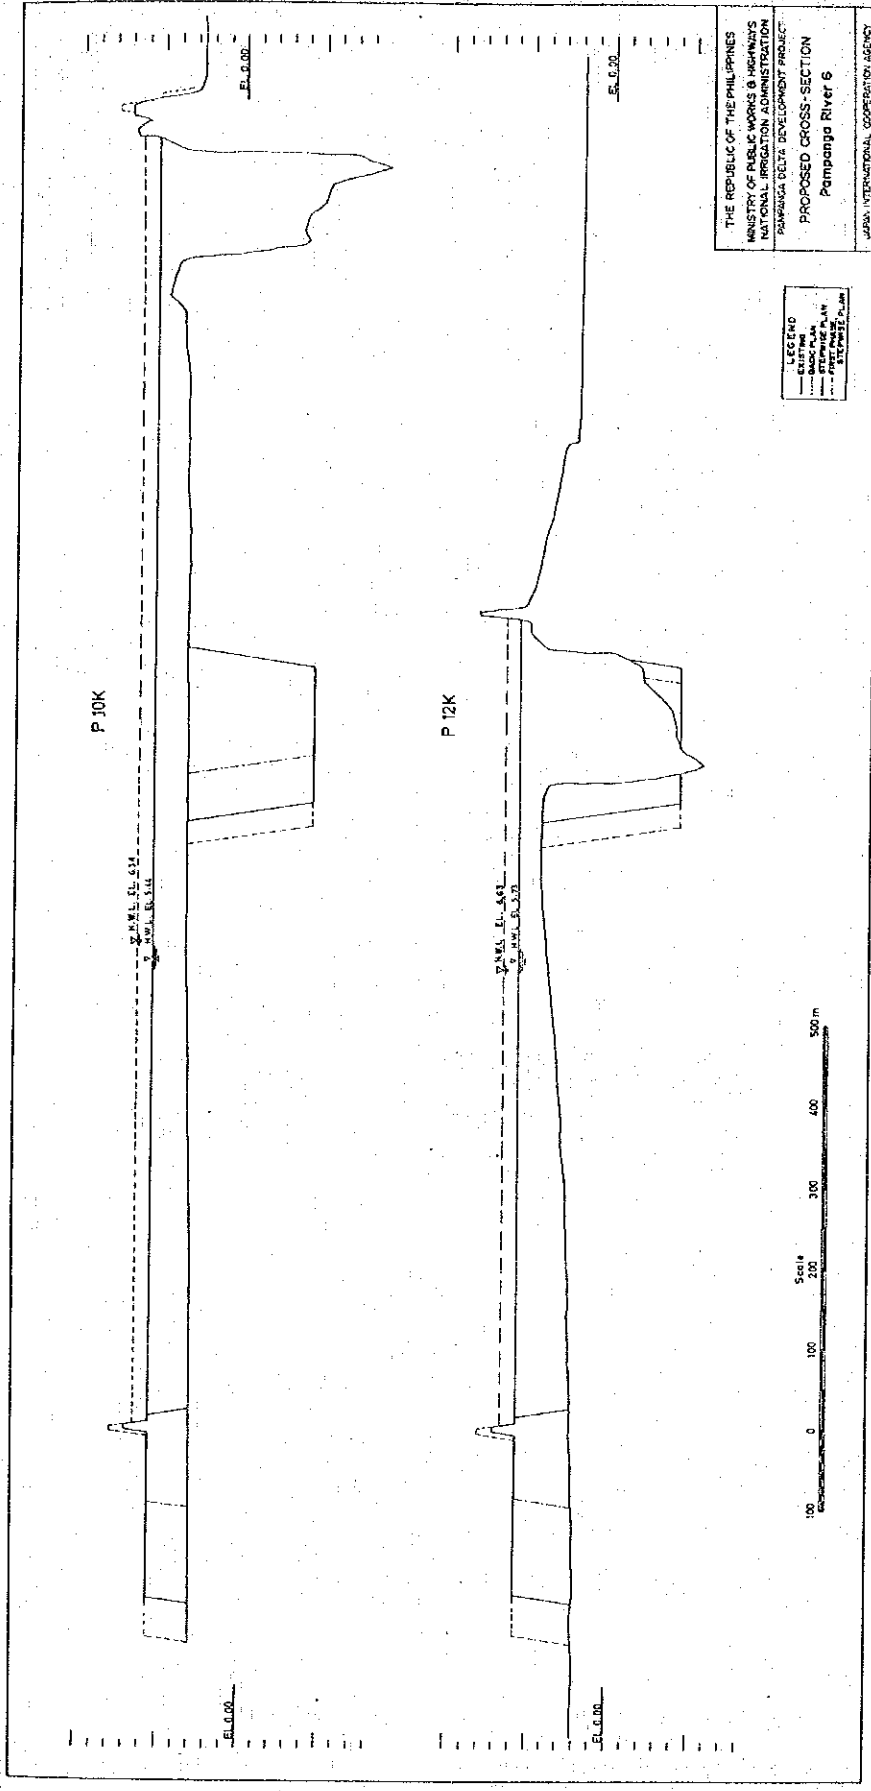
(7) PROPOSED CHANNEL CROSS-SECTION
